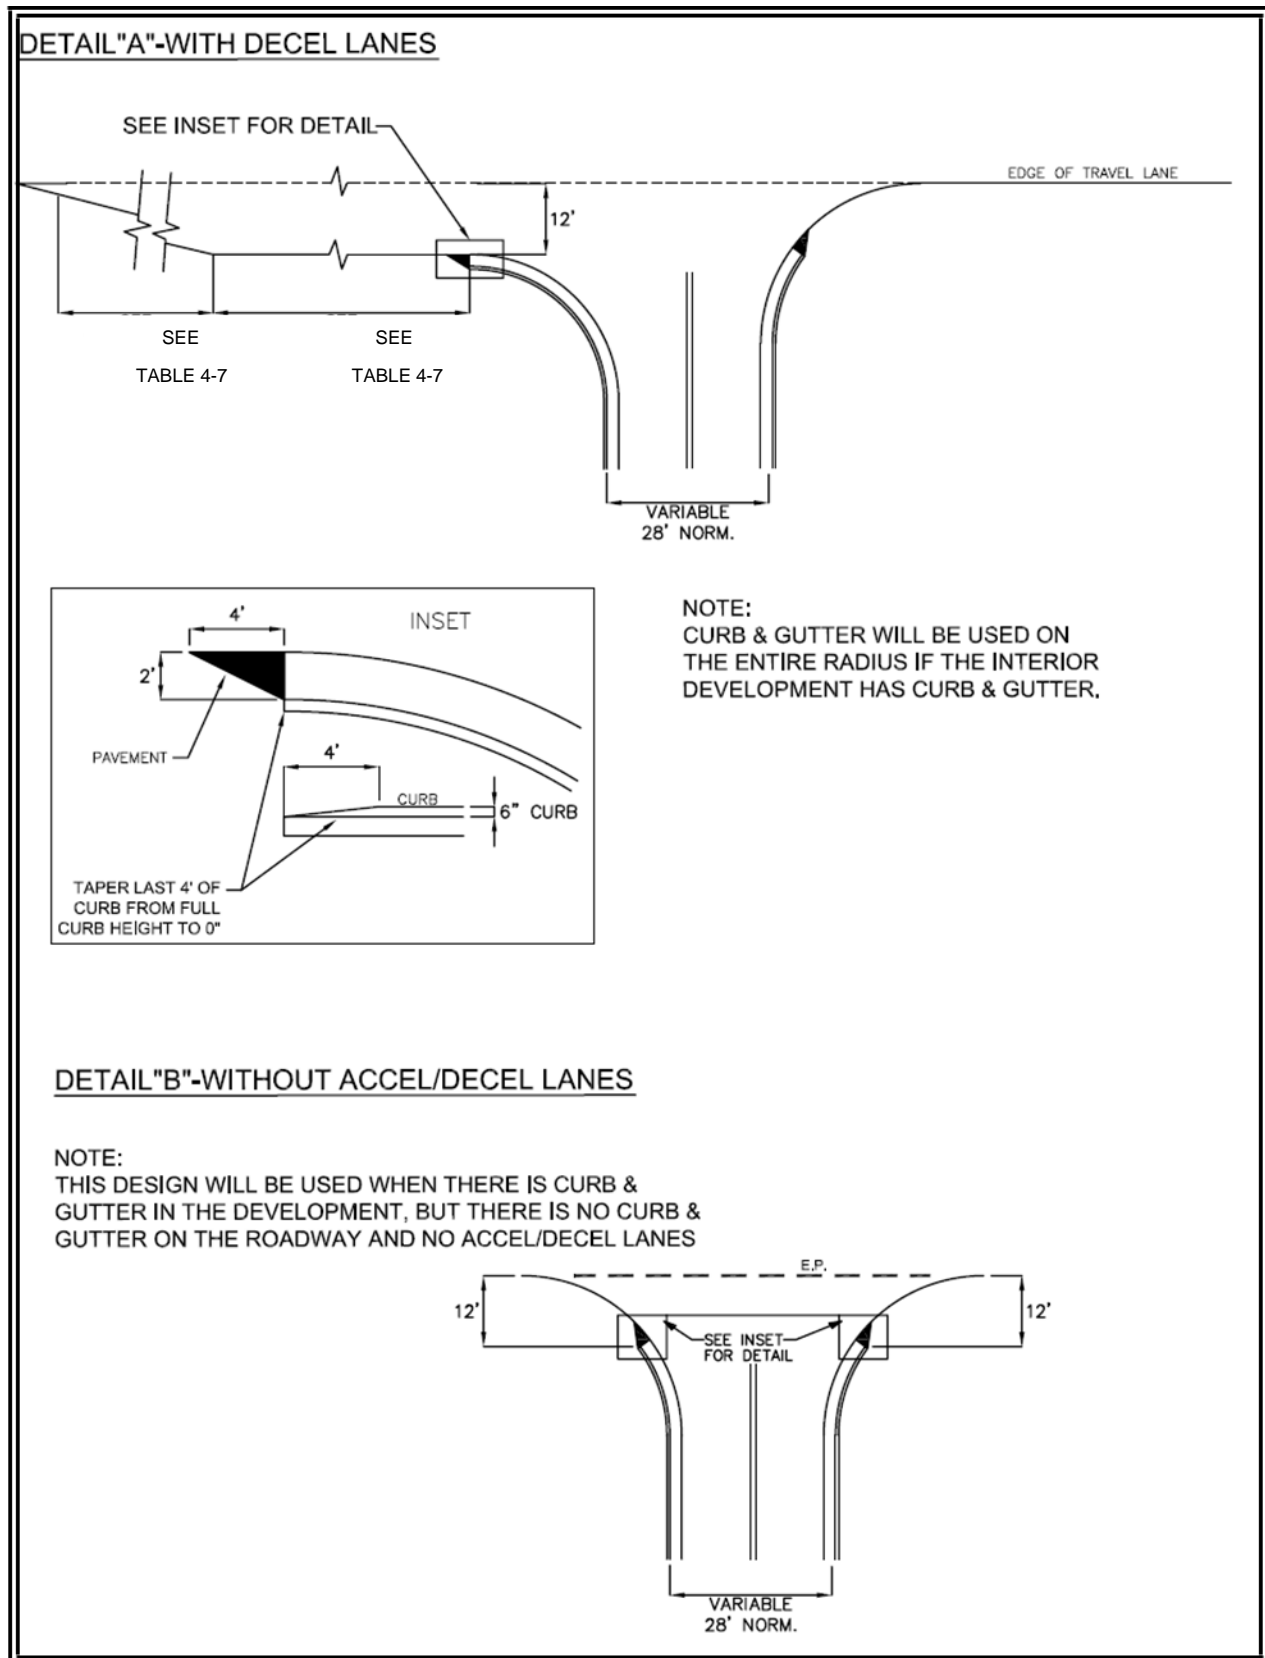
Connecting Driveways with Curb & Gutter to Rural Sections
